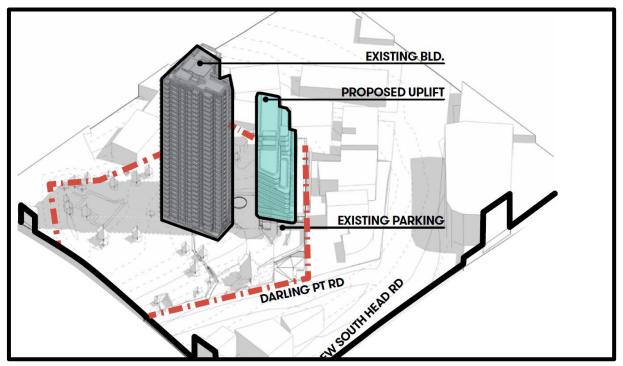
Scott Carver Concept Plan Adjoining Carpark (Scott Carver, 2022)
